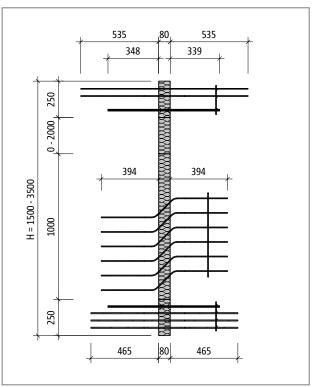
Schöck Isokorb® T type W-M4: Product layout
